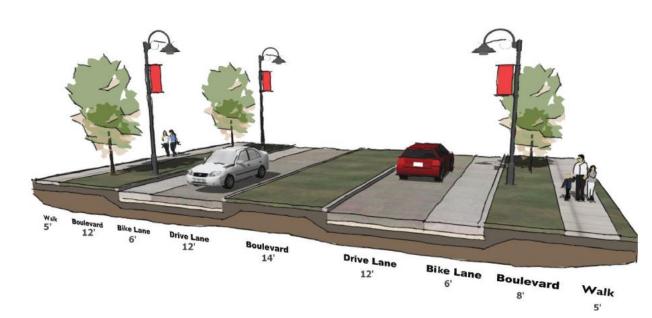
Parkway Concept Cross-Section Source: RDG Planning & Design
